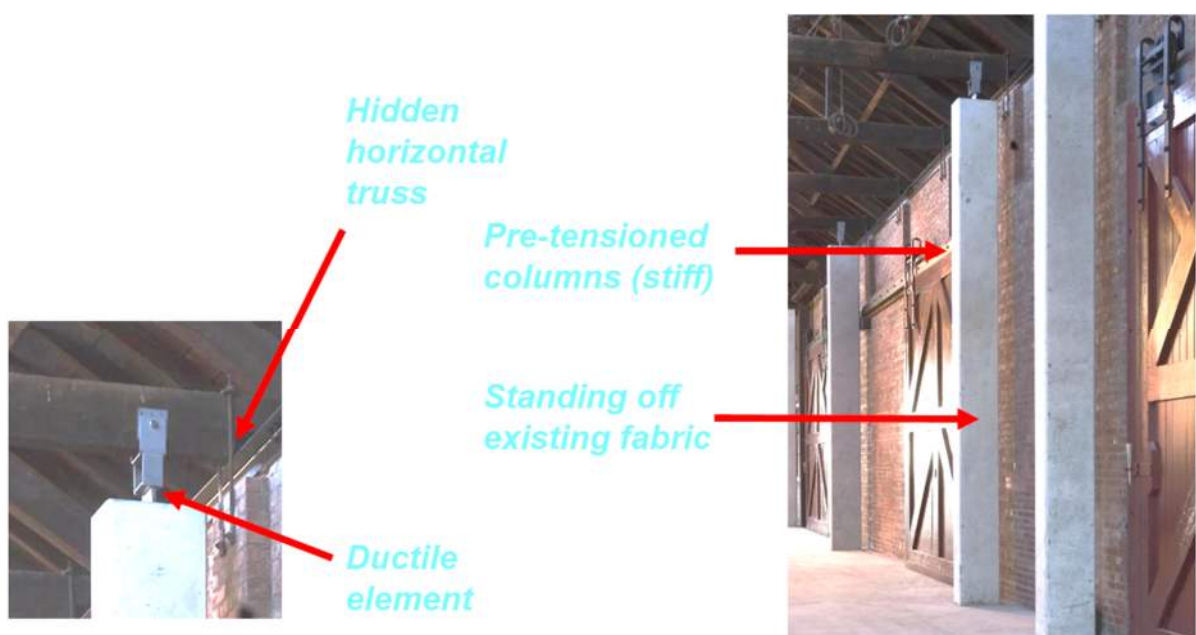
Shed 13 - View of refurbished interior and detail of new structure
